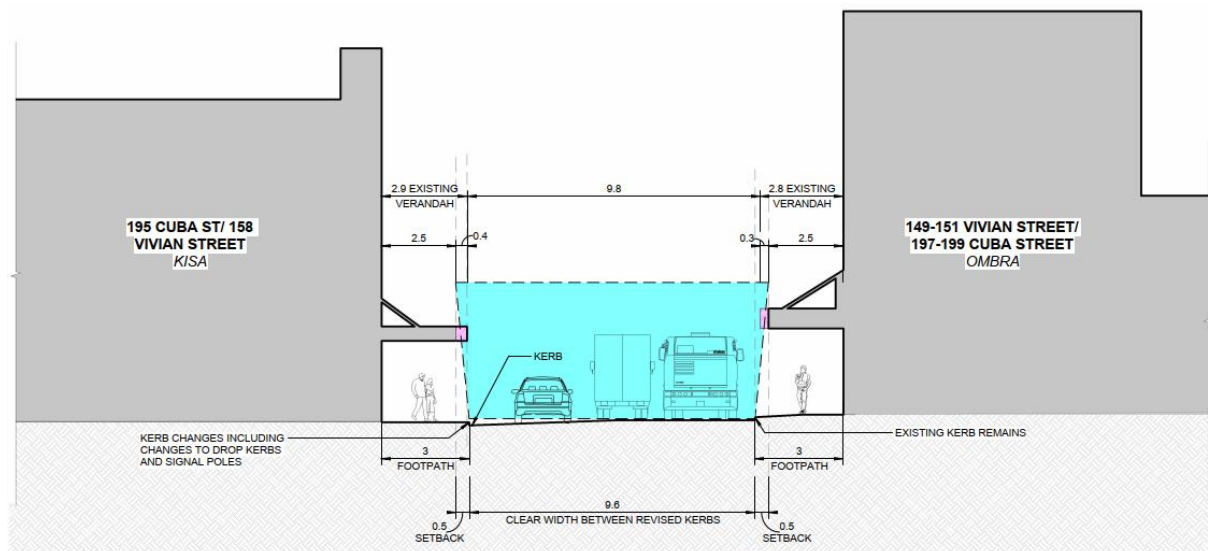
Section through 195 Cuba Street and 197-199 Cuba Street
